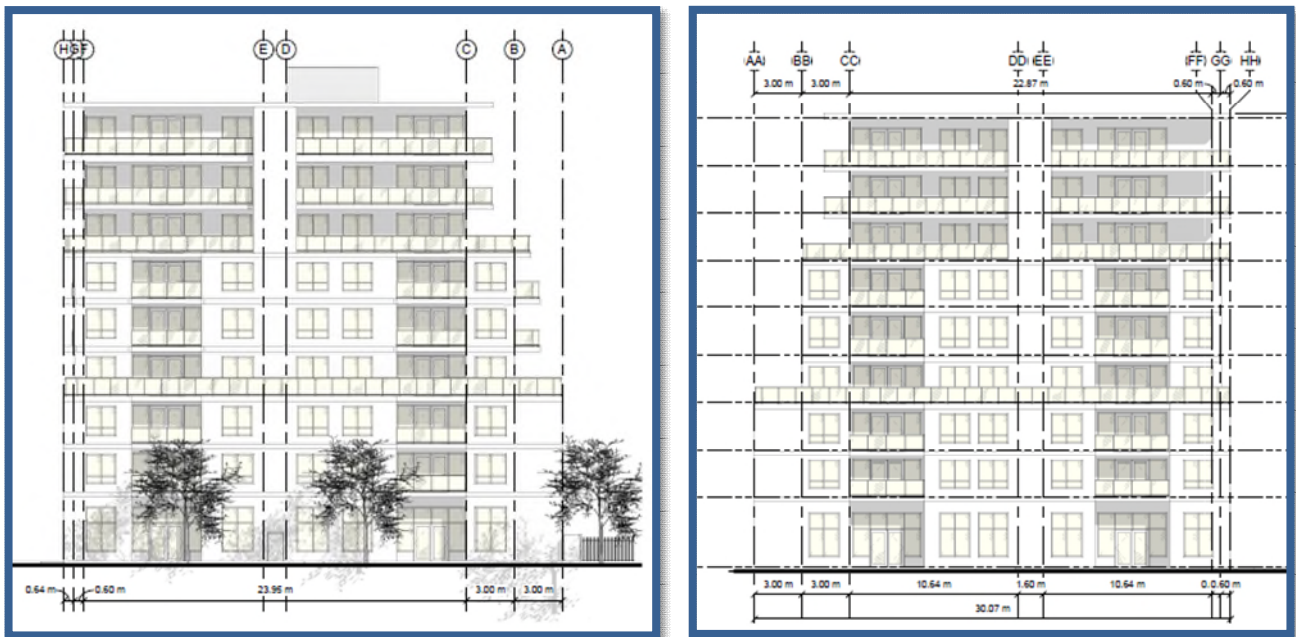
Eastern Elevations of the two proposed buildings (Building 1 – Left; Building 2 – Right)
